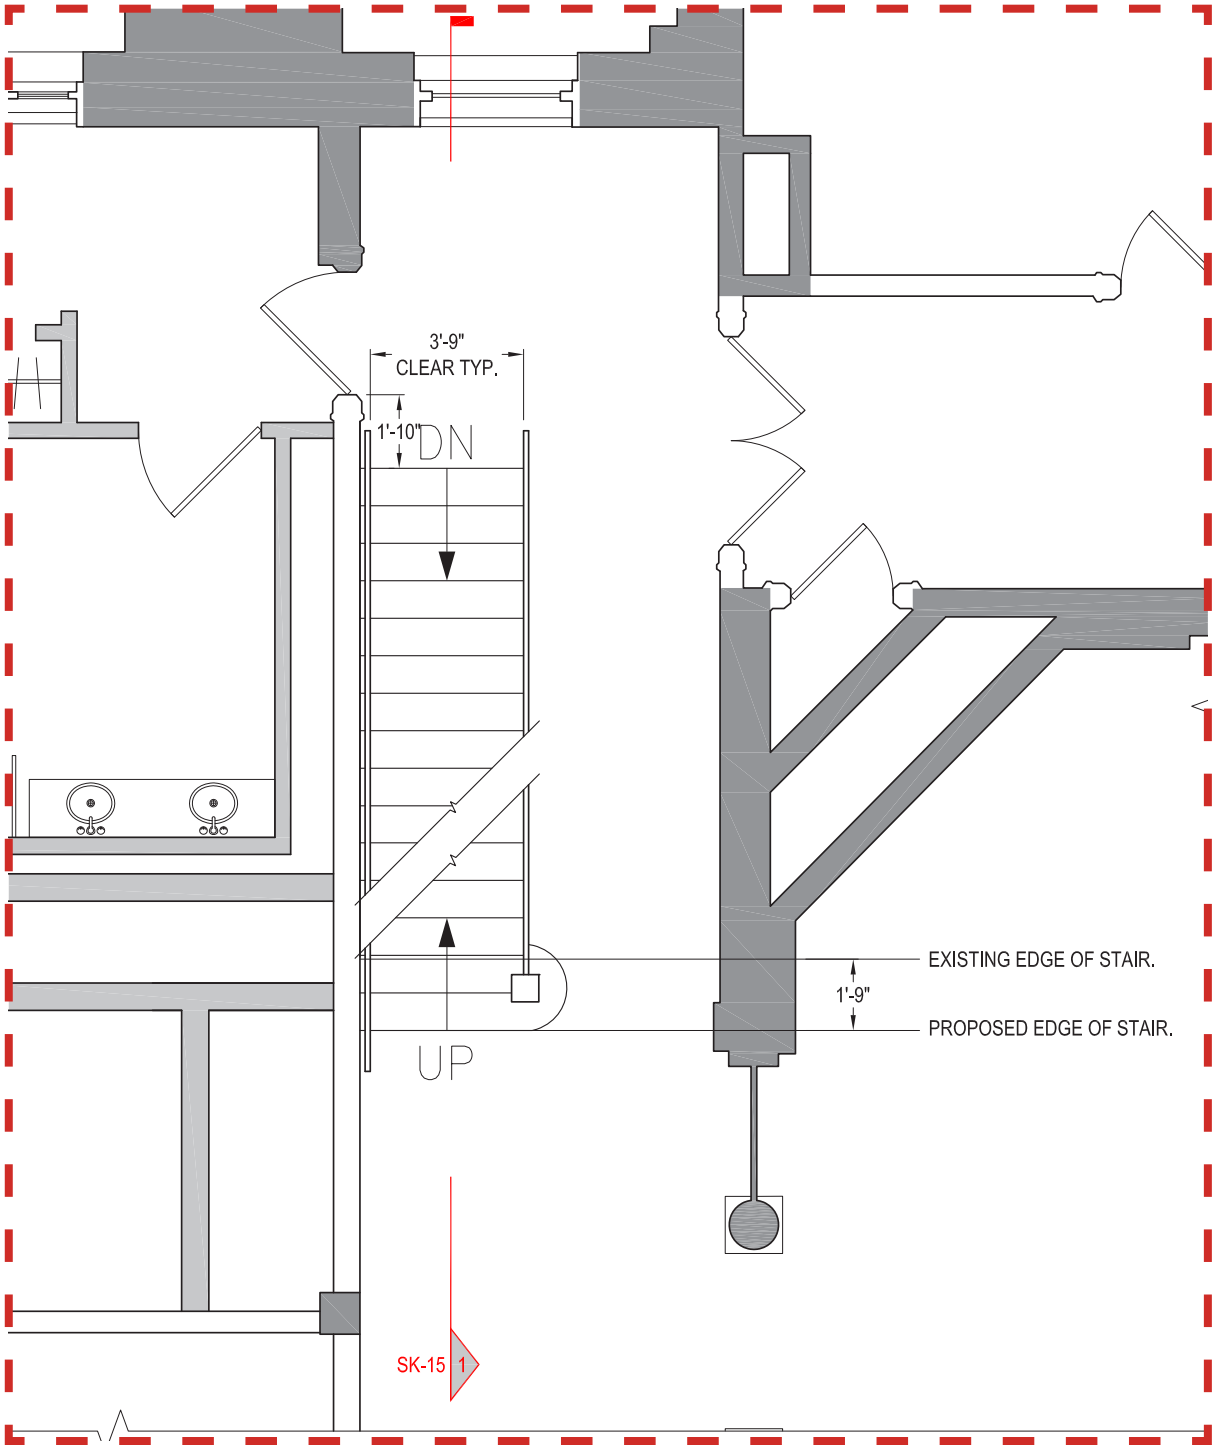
Proposed Second Floor Northeast Egress Stair
